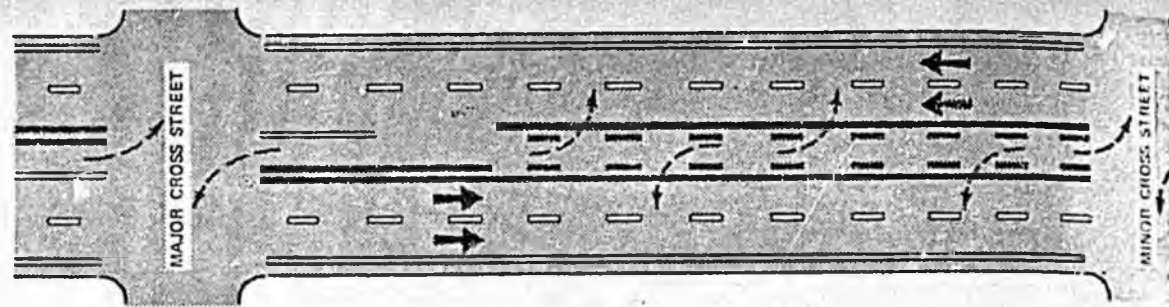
Recommended pavement marking for two-way left turn lanes. (From Ref. 18)
